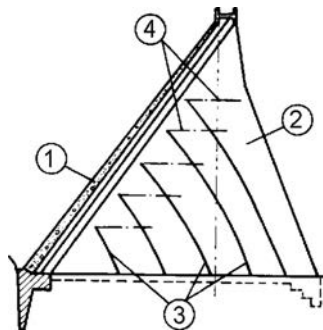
Morris Sheppard dam (USA). (1) Slab; (2) buttress; (3) expansion joints; (4) structural joints.
